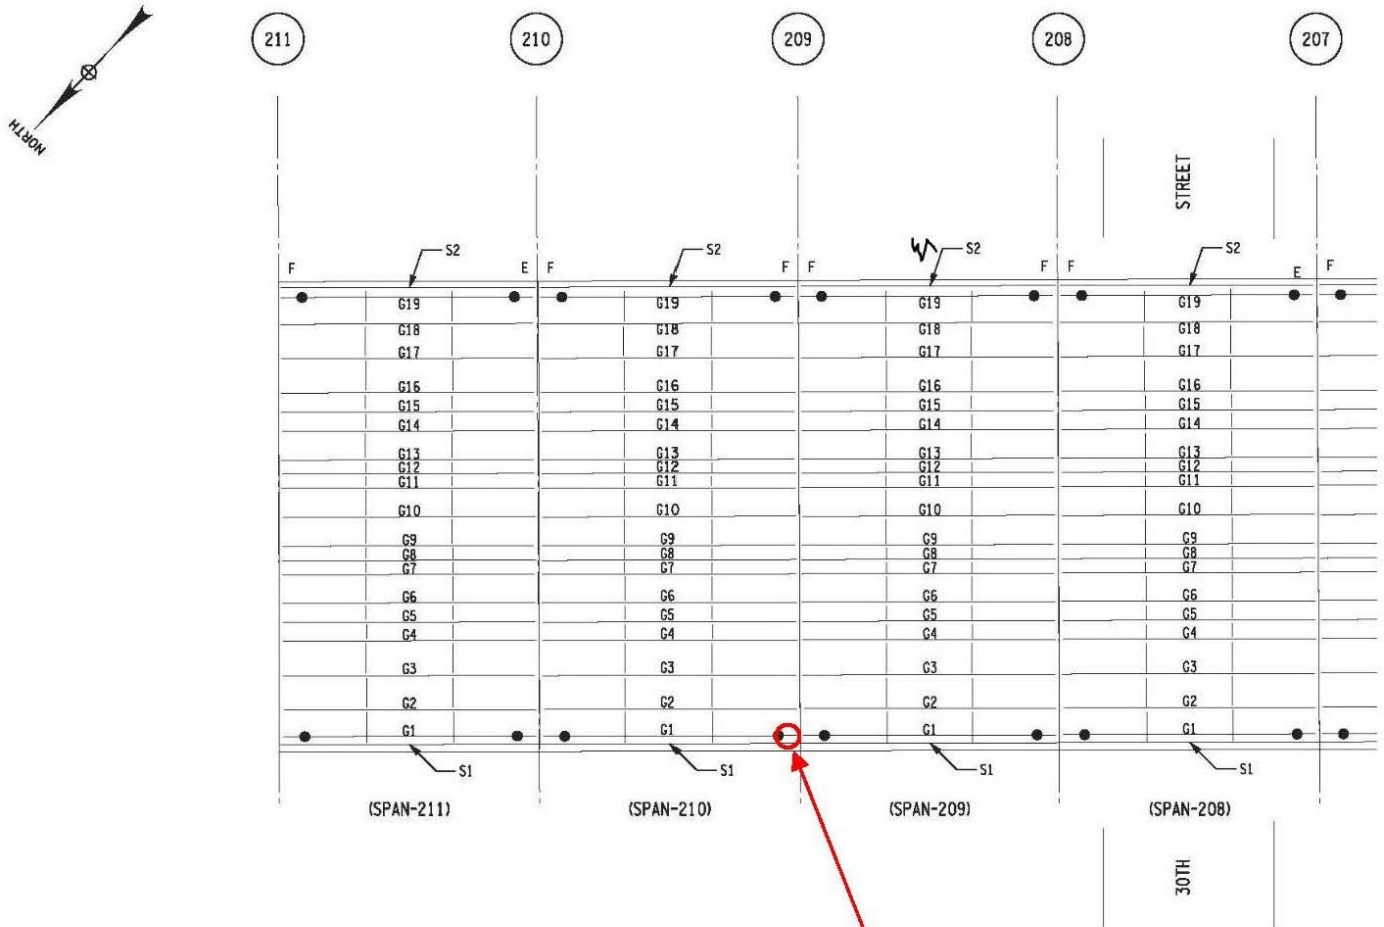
Photo Filename: Sketch of Span 210.jpgSPAN 210, GIRDER G1 BEAM END AT PIER 209(LOOKING LEFT)N.T.SSPAN 210, GIRDER G1 BEAM END AT PIER 209(LOOKING RIGHT)N.T.S*Attachment Description: SN 210 G1 at Pier 209 Sketch
